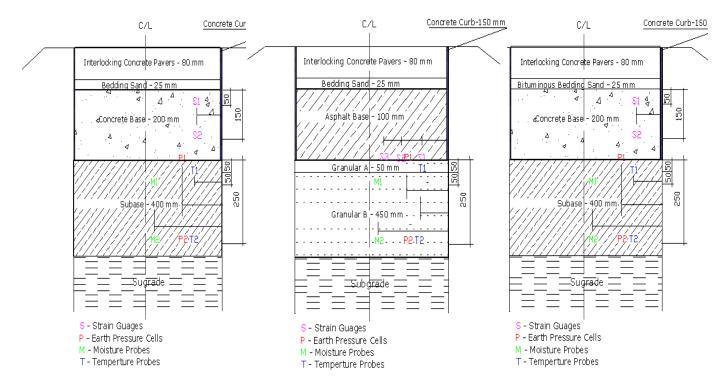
Profile View of Instrumented Crosswalk Sections at Test Track
